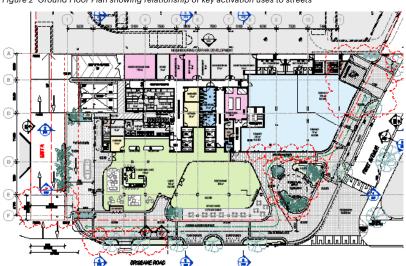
Ground Floor Plan showing relationship of key activation uses to streets
